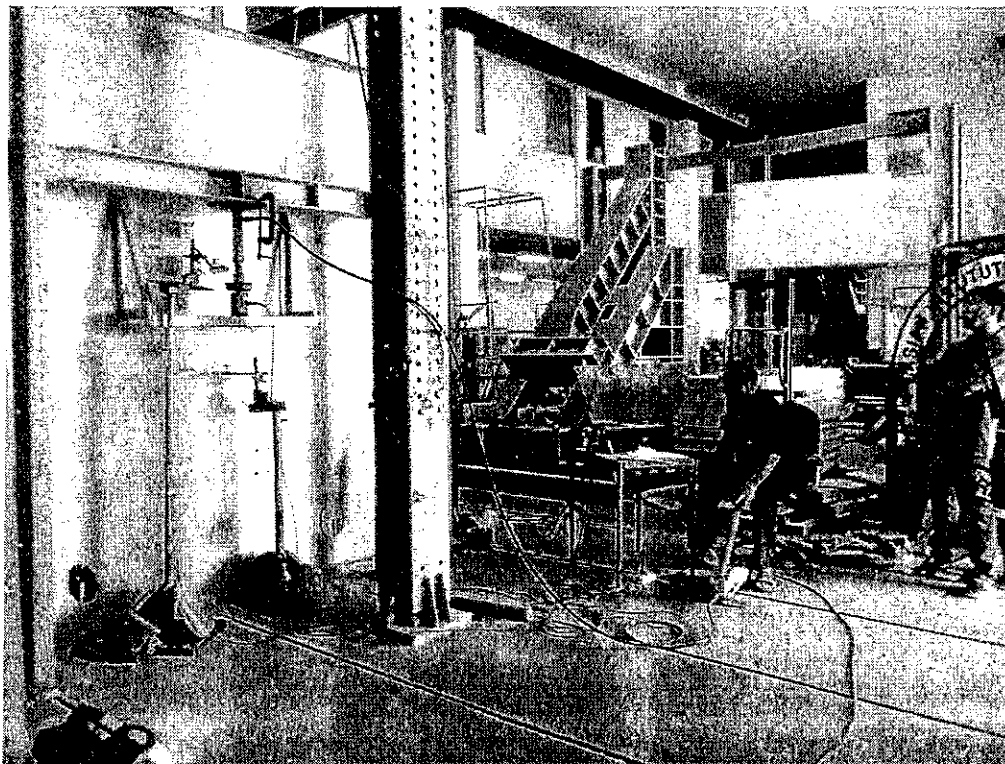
Testing the heavyweight anchorage by eccentric downward loading (wall cupboard).
